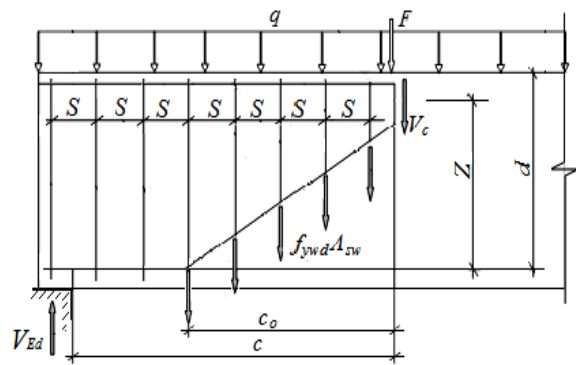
Scheme of calculated forces on the shear force action on an inclined crack
